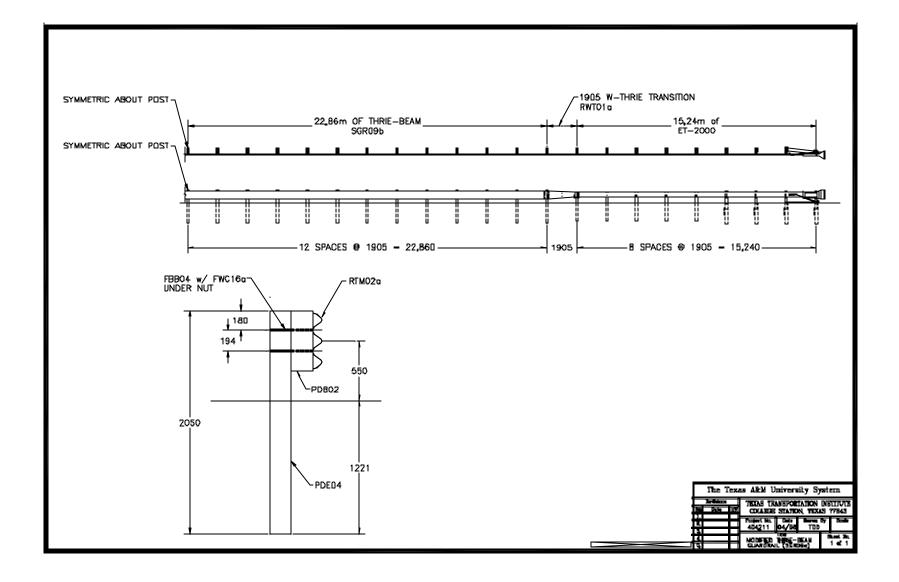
Details of the Strong wood post three beam guardrail installation for test 404211-11.
